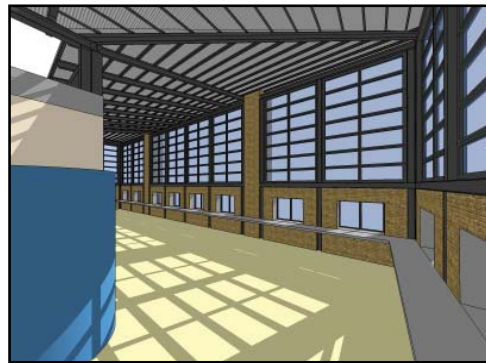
Openable glazed facades allow for an abundance of natural lighting and ventilation. Water tanks store water collected from the roof
